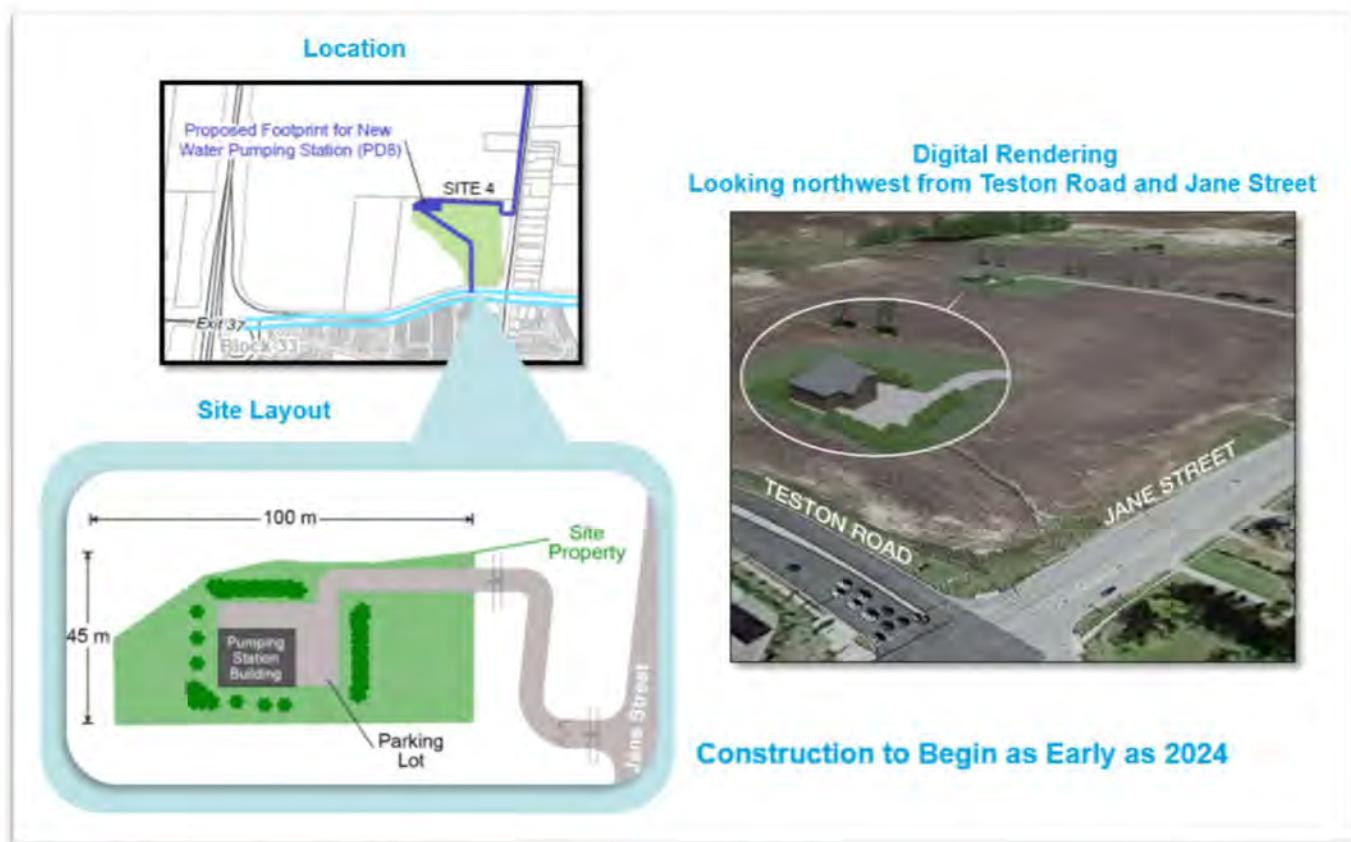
Proposed Footprint, Site Layout and Rendering of the Pressure District 8 Pumping Station at Site 4
